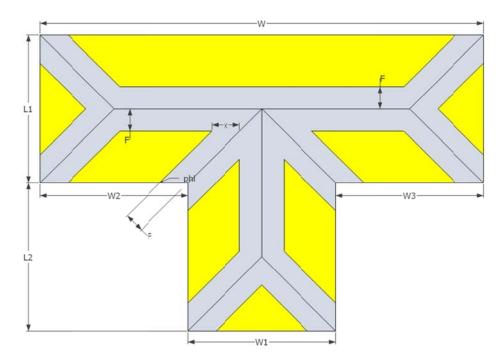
Potential solar zones for a T-shaped building with a hip roof
